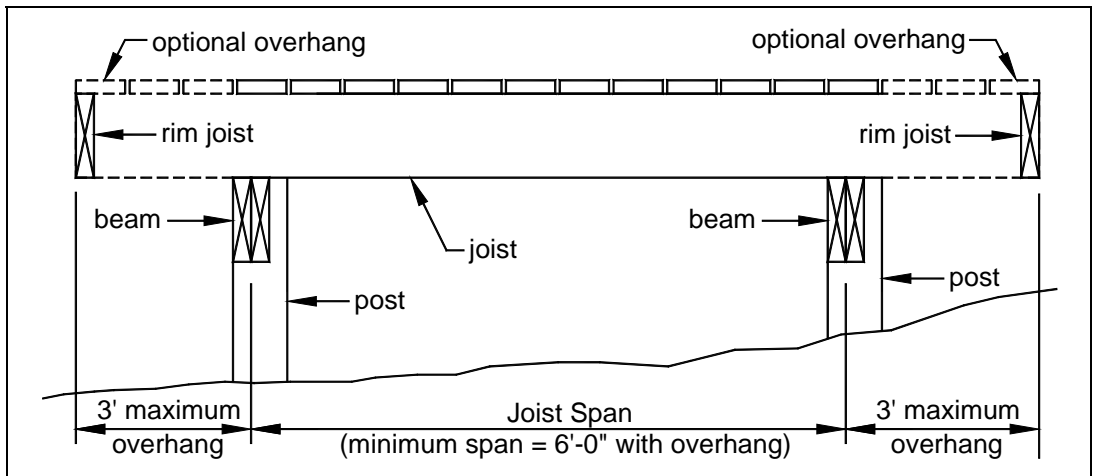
JOIST SPAN - FREE-STANDING DECK
